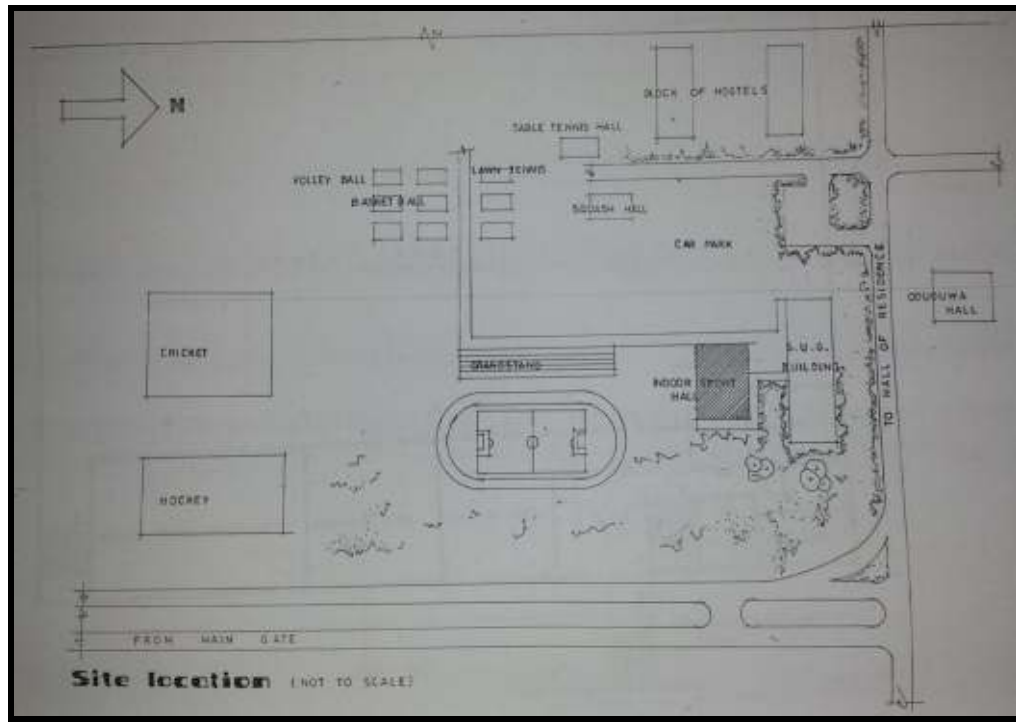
Showing Sketch of OAU Sports Complex Layout.
